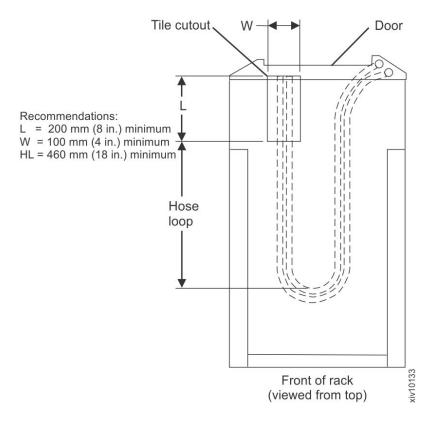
Raised-floor and non-raised-floor hose management example 2: loop under the rack with door closed
